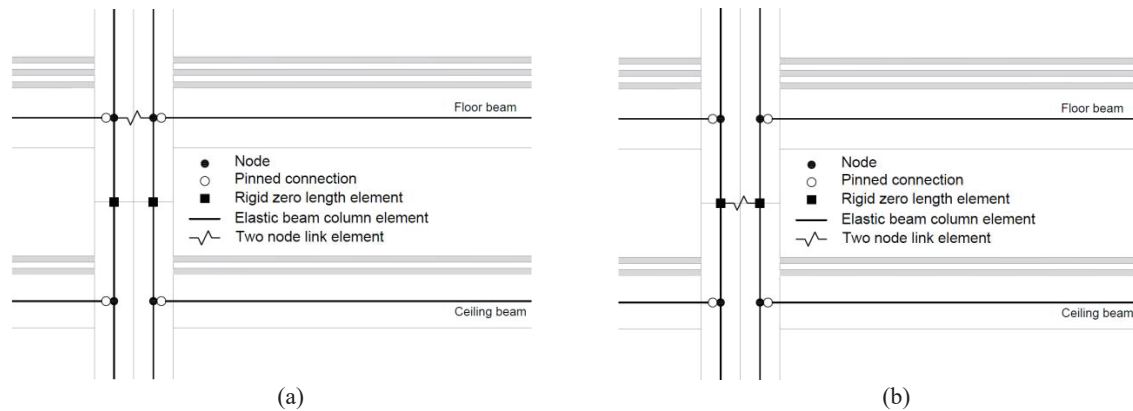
Horizontal link located a) at the diaphragm level, and b) at the column joint level
